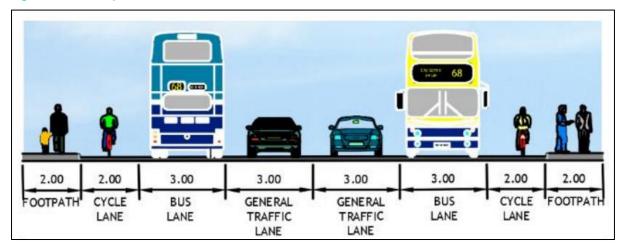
EPR Option Cross Section B – B on Walkinstown Avenue
